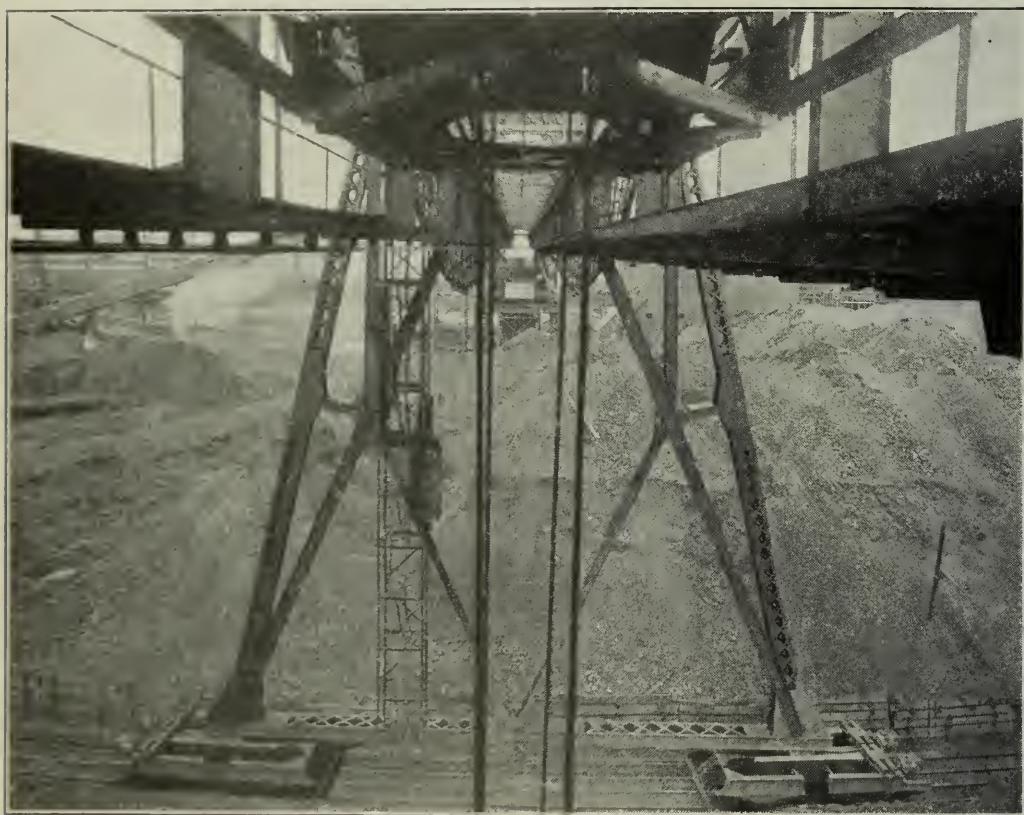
VIEW LOOKING TOWARD PIVOTED END, BRIDGE OF THE MILWAUKEE
